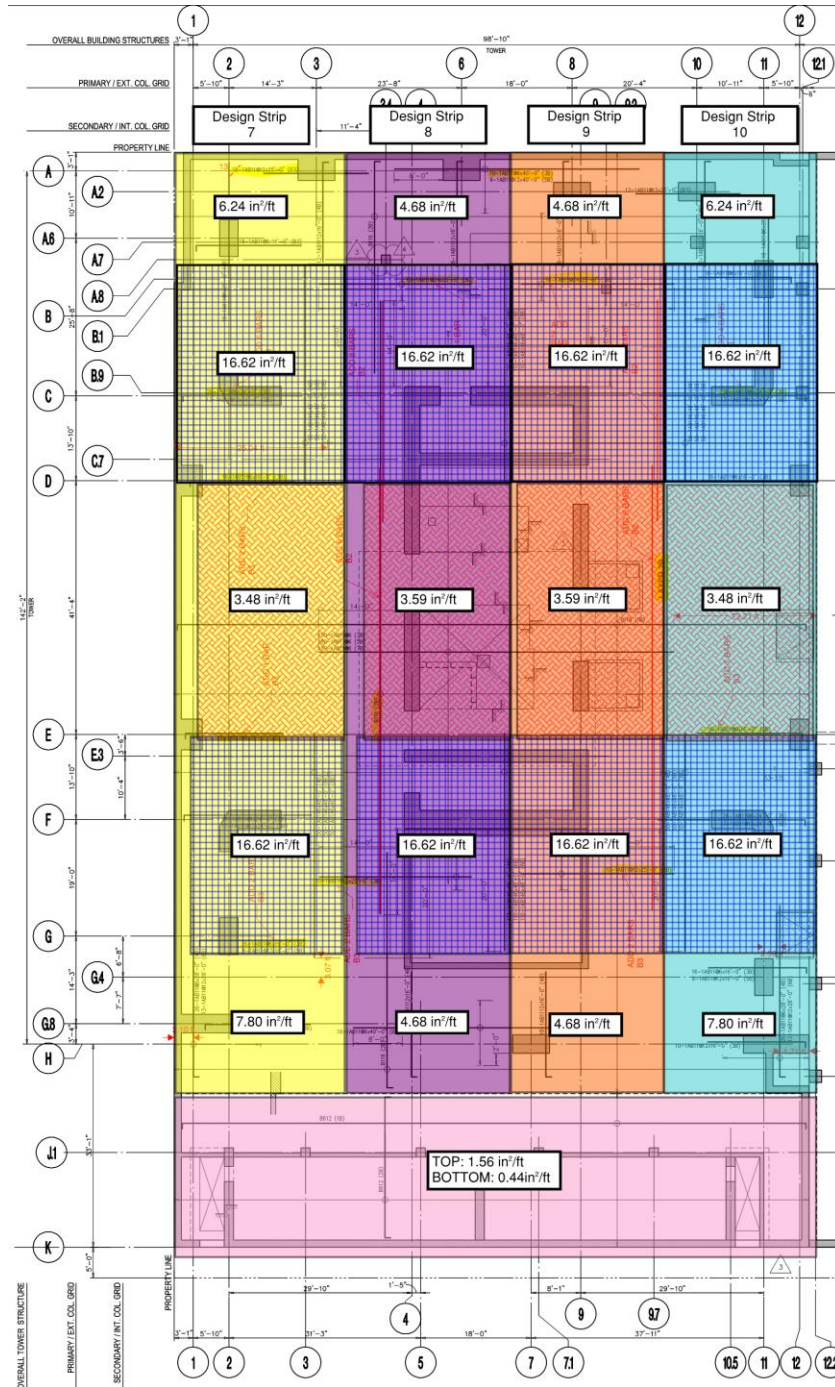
Top and Bottom North – South Reinforcement Area per Foot of Slab
